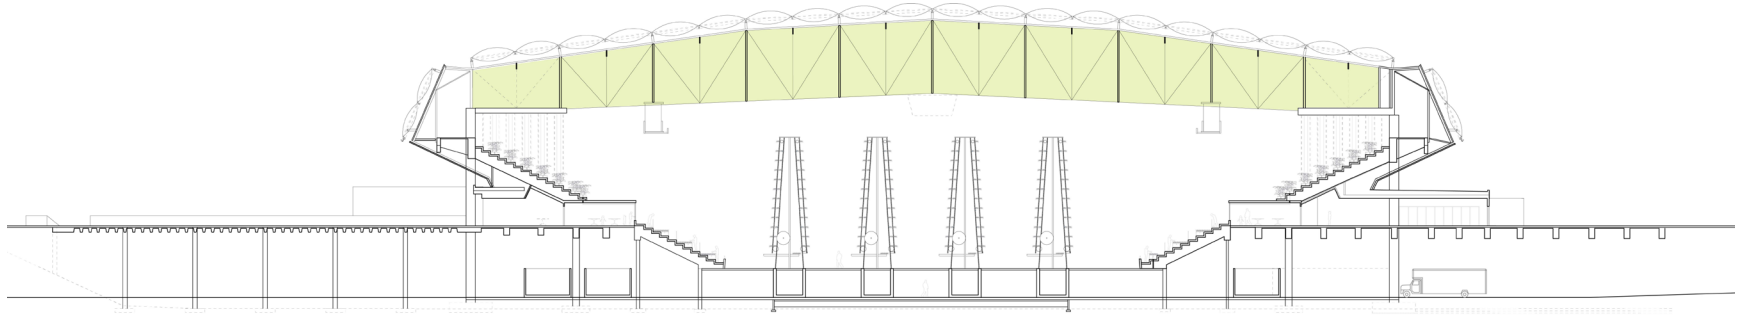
Section looking east-west, highlighting existing roof structure, which supports the new ETFE roof panels
